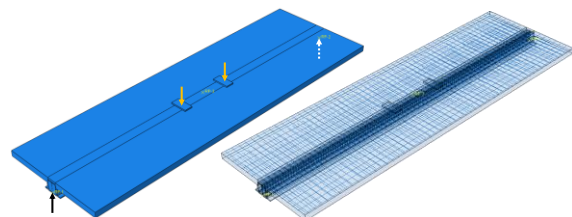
Slim-floor beam – 3D view: static scheme; reinforcing bars arrangement
